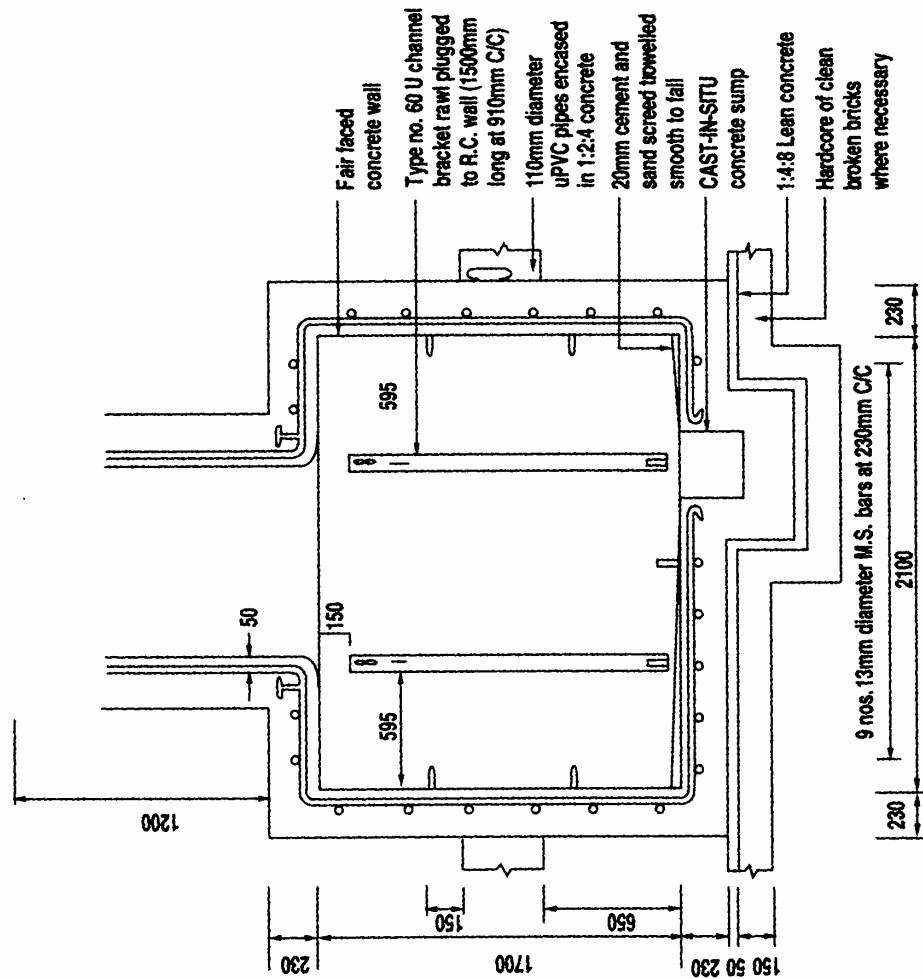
MANHOLE DRAWINGS - MX3
